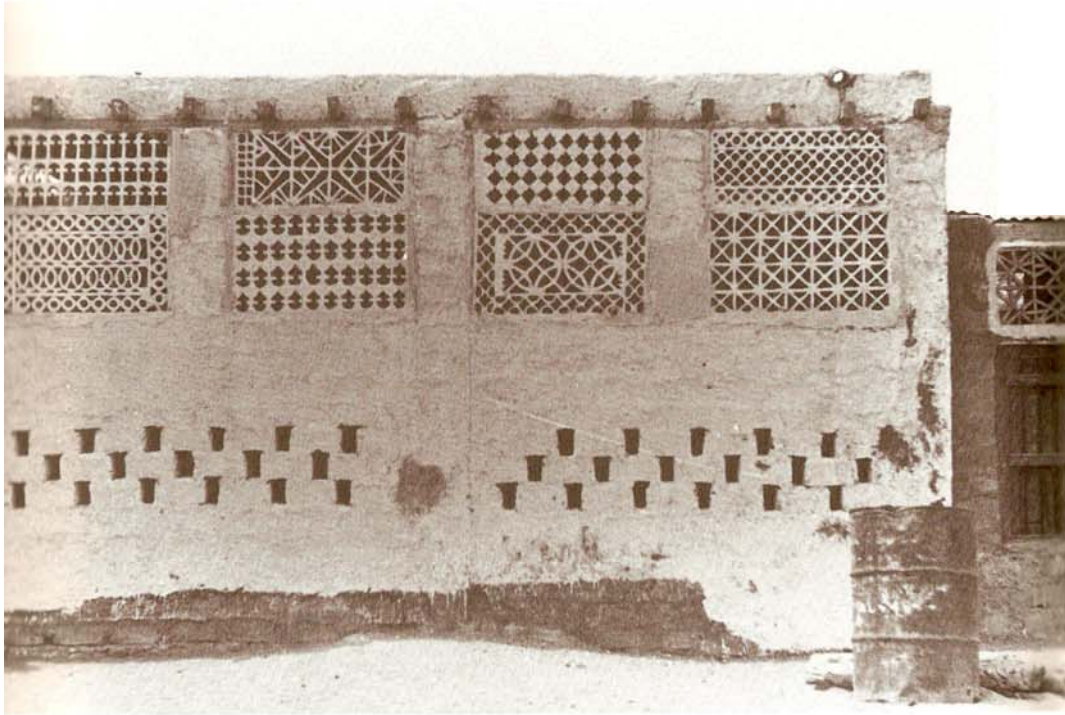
Claustra* in a parapet wall on the roof of a building in Oman. (See p. 55.)
